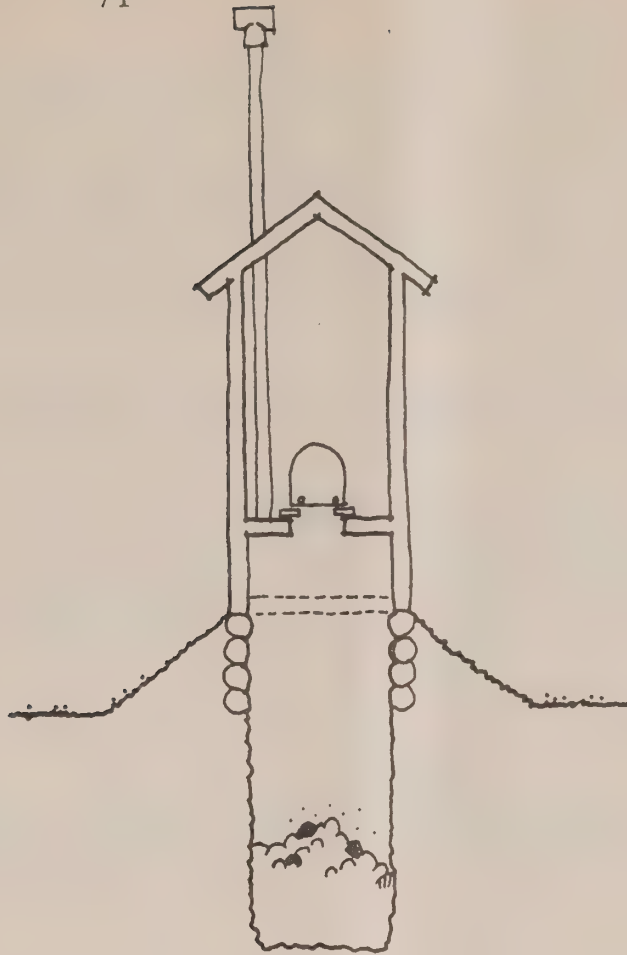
Improved outhouse with raised, bermed crib; vent stack and seat with lid.
